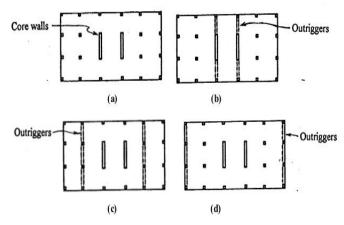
(a) Typical Floor Plan (b) Conventional Outrigger Plan (c) Offset Outrigger Plan (d) Alternative Offset Outrigger Plan
